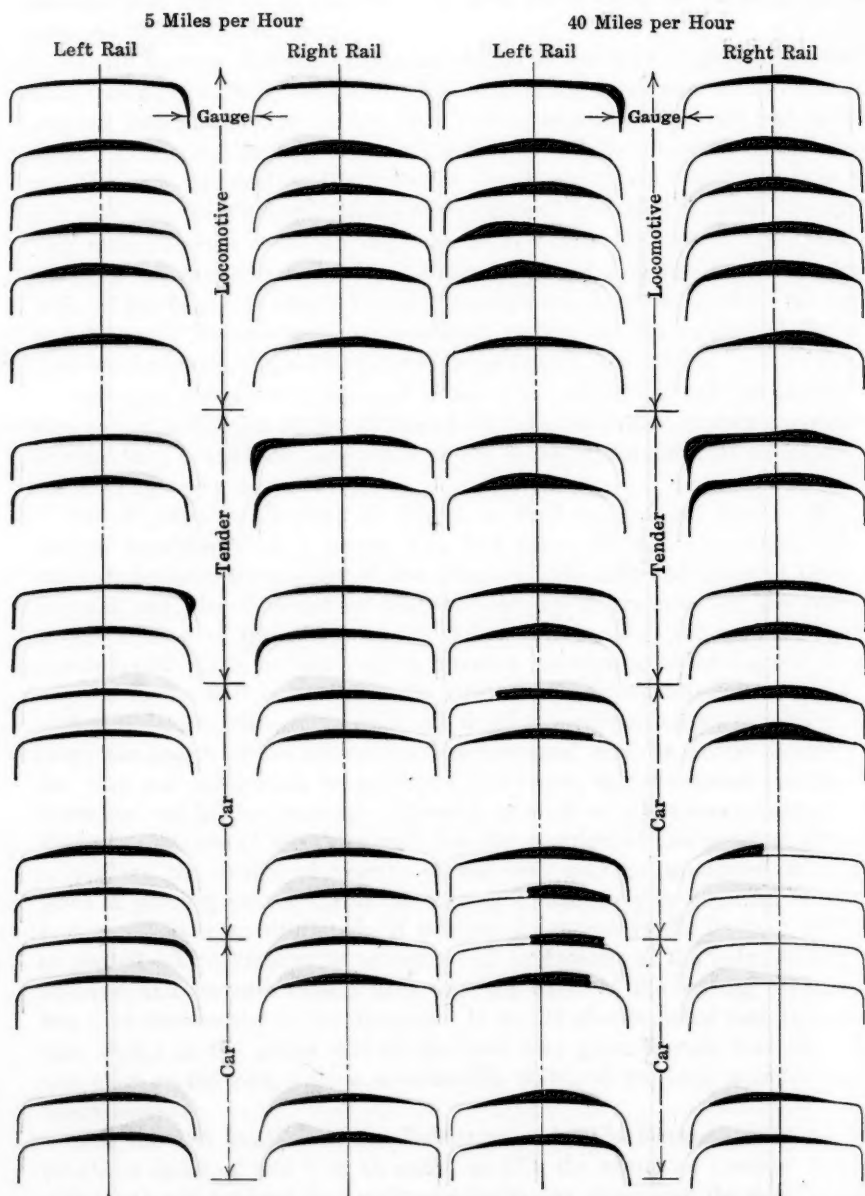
BEARING OF WHEEL ON RAIL. STRAIGHT TRACK. INCLINED TIE-PLATES. MIKADO TYPE LOCOMOTIVE AND CARS. BALTIMORE AND OHIO RAILROAD.
